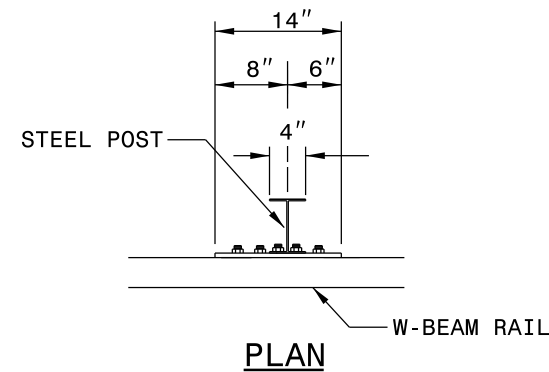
DETAIL OF GUARDRAIL BURIED IN CUT (BIC)
